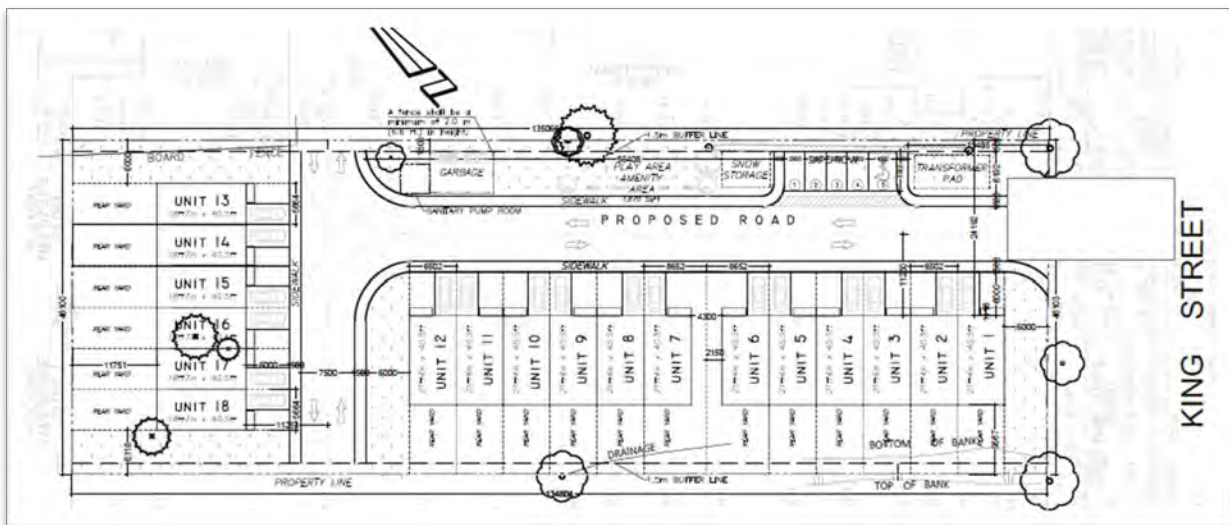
Site plan submitted by Professional Floor Plans Inc, August 10<sup>th</sup>, 2022
